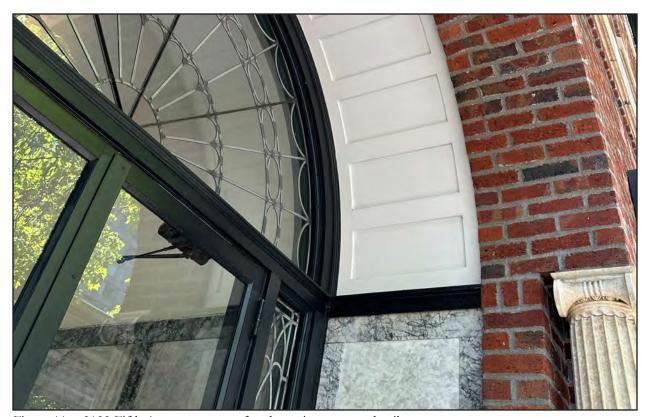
• 2132 Fifth Avenue, western façade, main entrance detail
